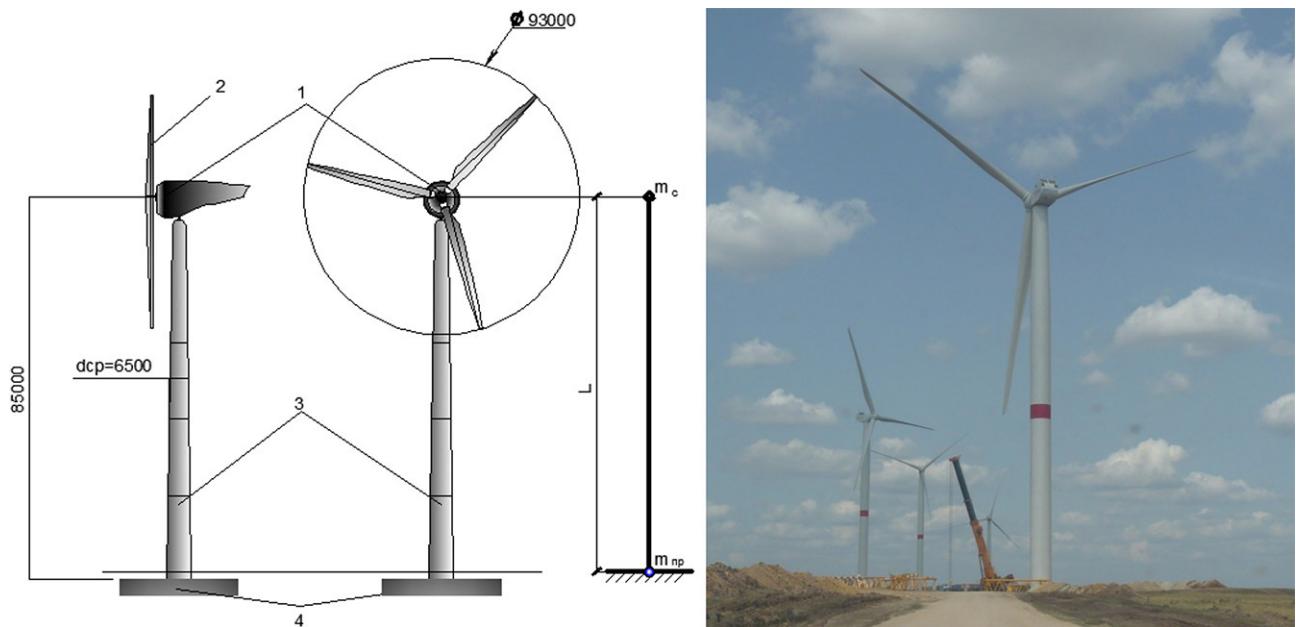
Wind turbine in Erementau: 1 – gondola, 2 – blade, 3 – tower, 4 – foundation
